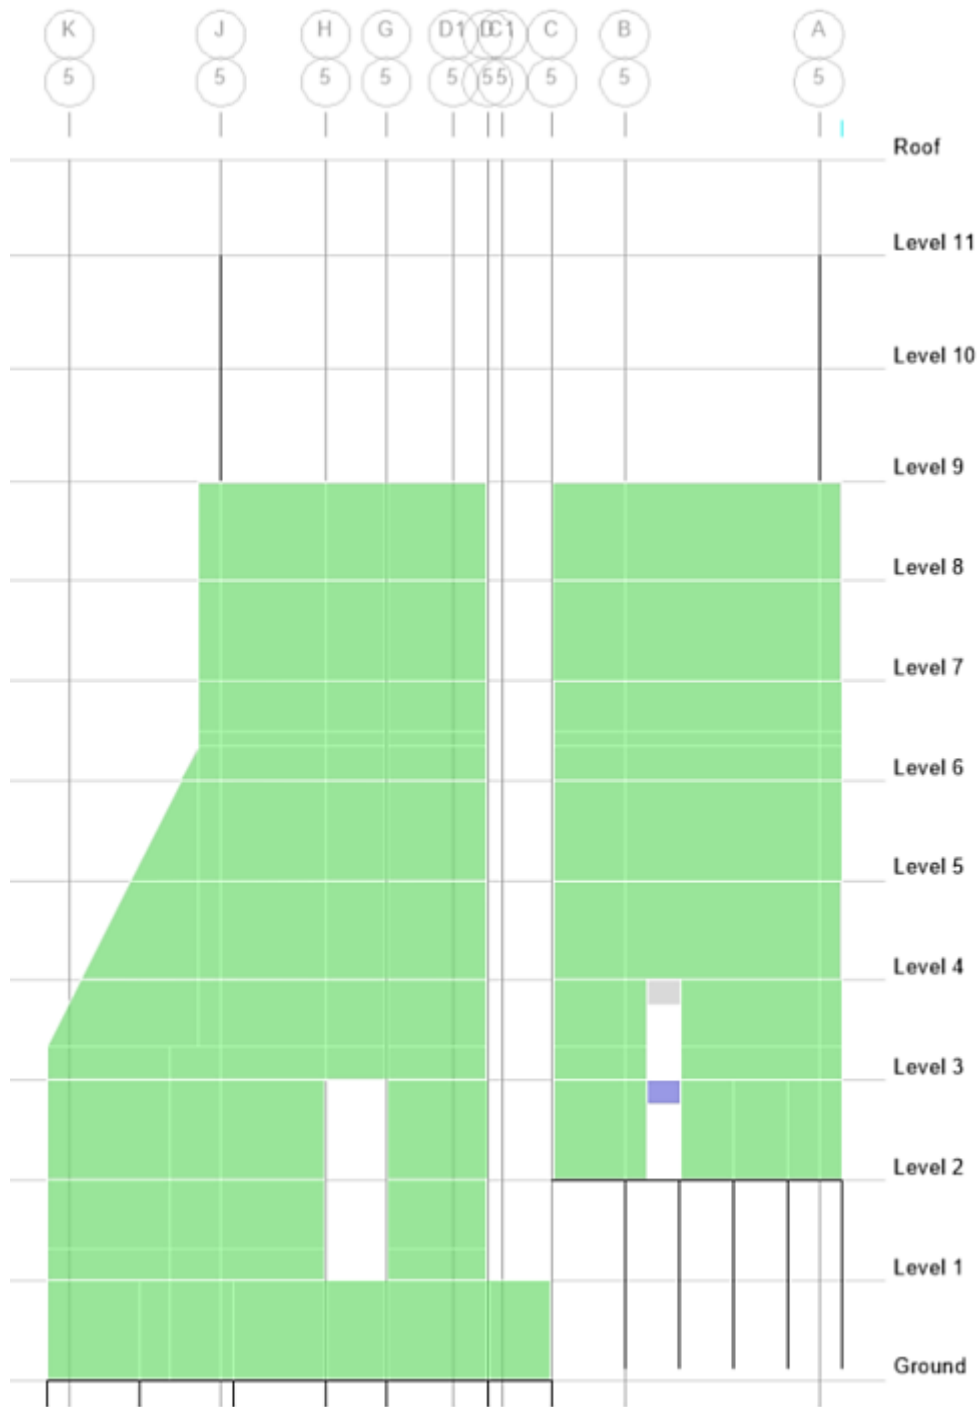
, Gridline 5 Transverse Direction Wall – North Structure
